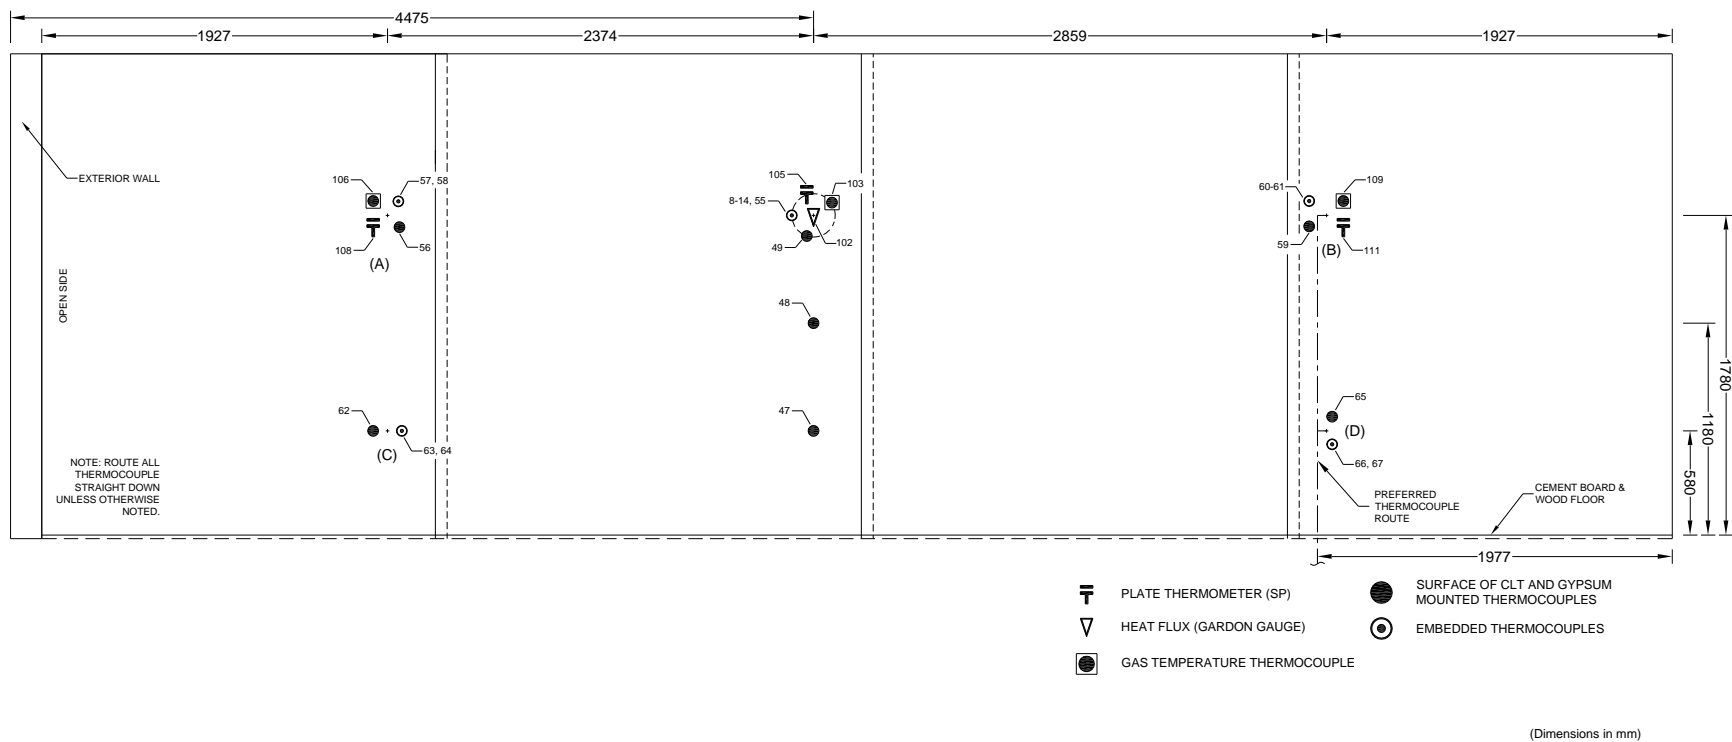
Test 1-6 Large Compartment CLT - W1 - Instrumentation Layout
